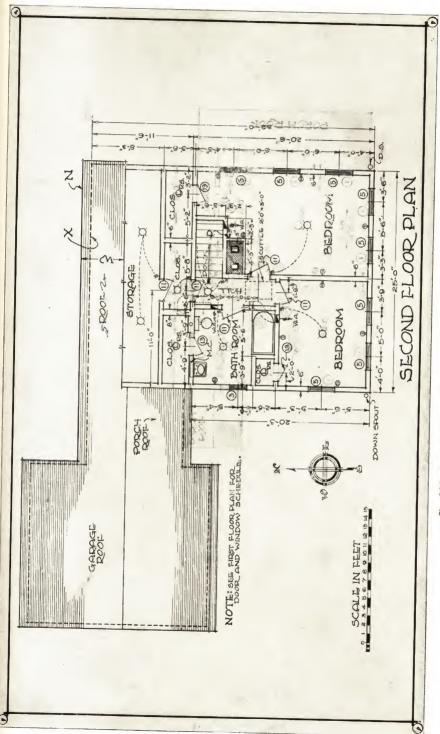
Step 4 in Drawing Remodeling Plans for Second Floor
